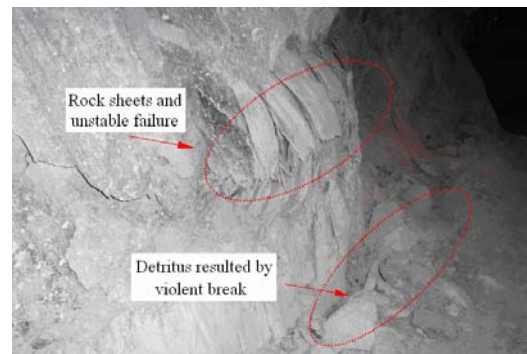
Rock burst on the wall of tunnel after blasting excavation
